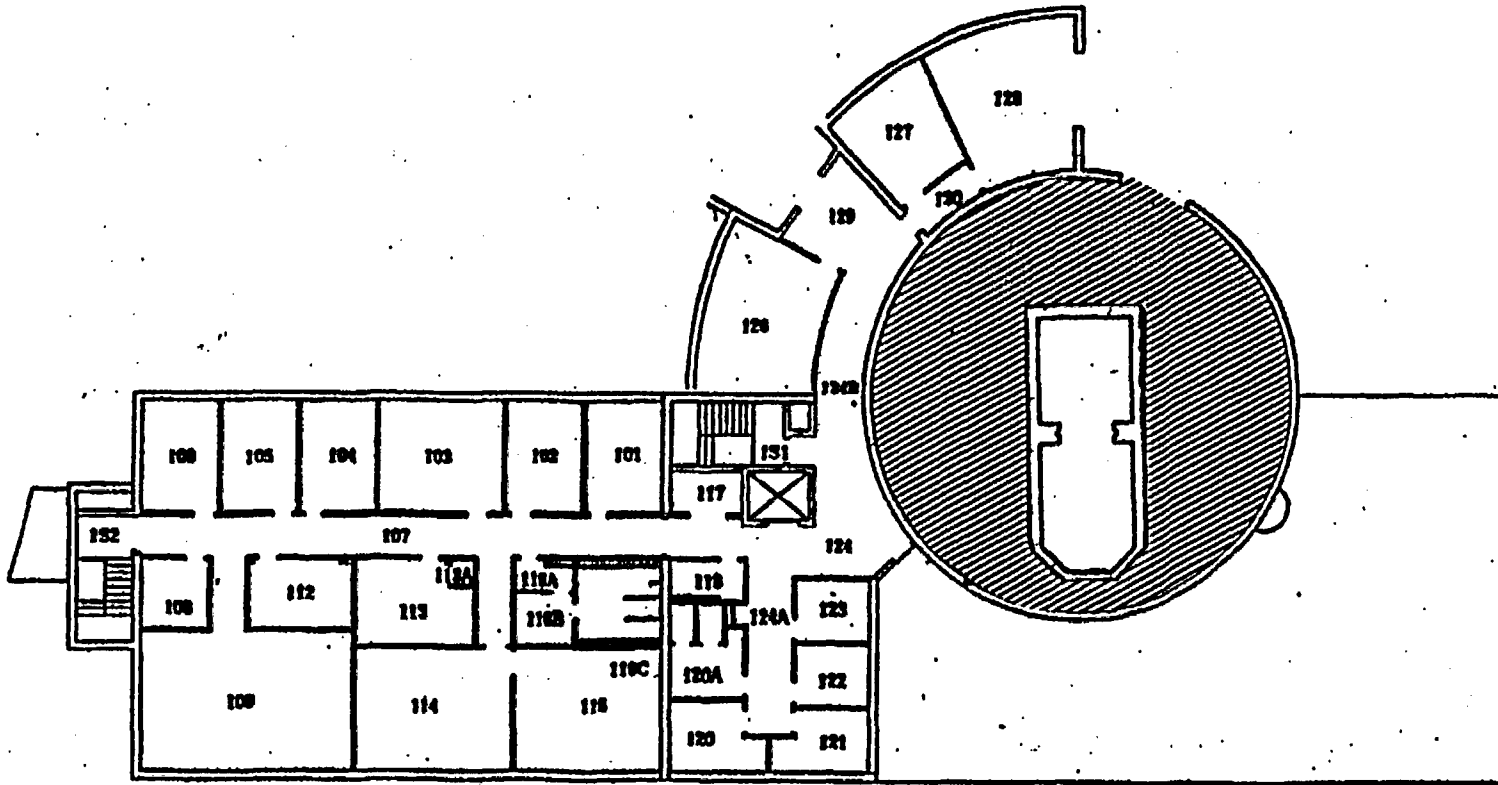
UVA Reactor First Floor Plan View Indicating
